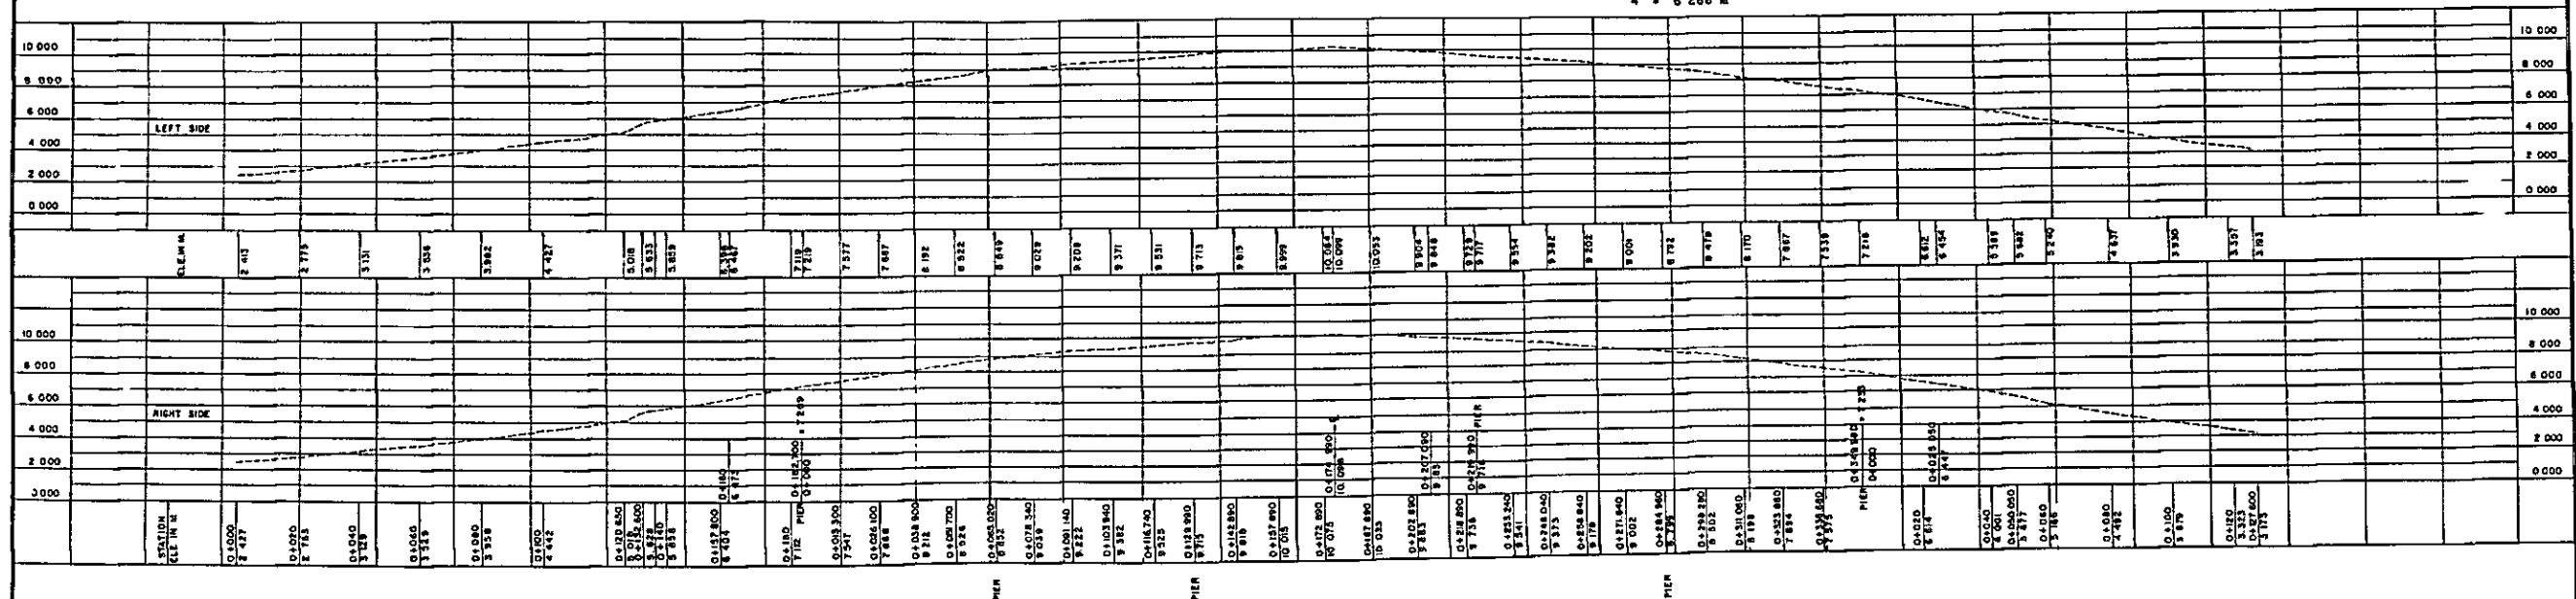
LONGITUDINAL ELEVATIONS ON THE CURBSTONE OF THE ROAD SURFACE - KRUNG THEP BRIDGE
